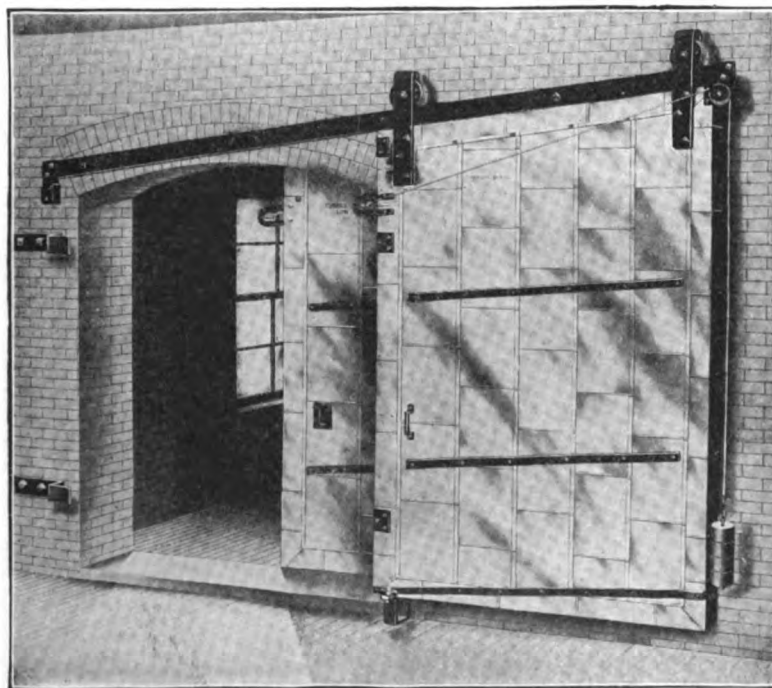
DETAILS OF LION STANDARD TIN-CLAD GRAVITY FIRE DOOR
